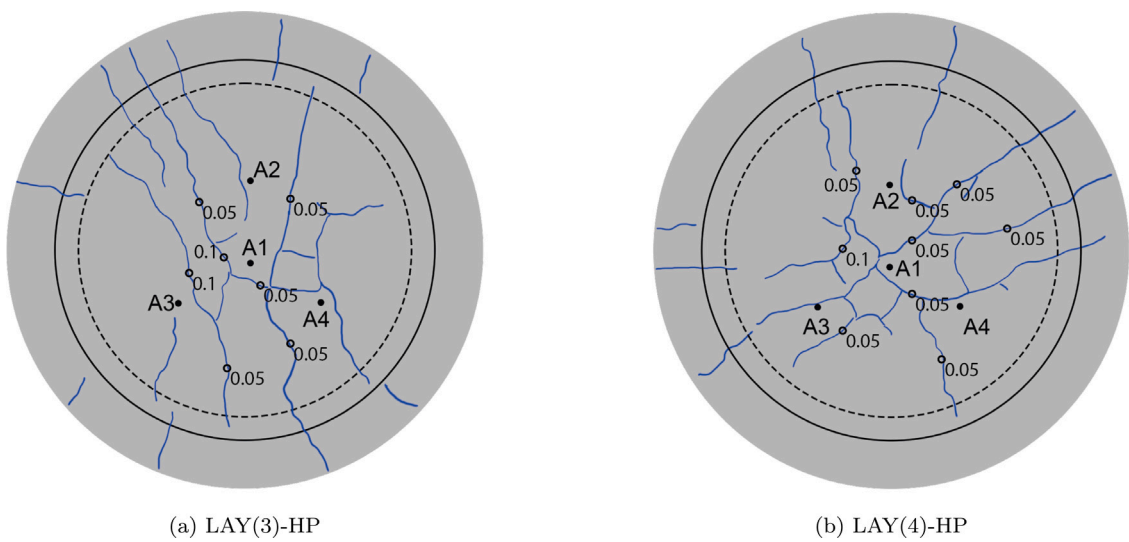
Back side crack pattern of the layered specimens (LAY) after the high-pressure tests (crack widths in mm).
